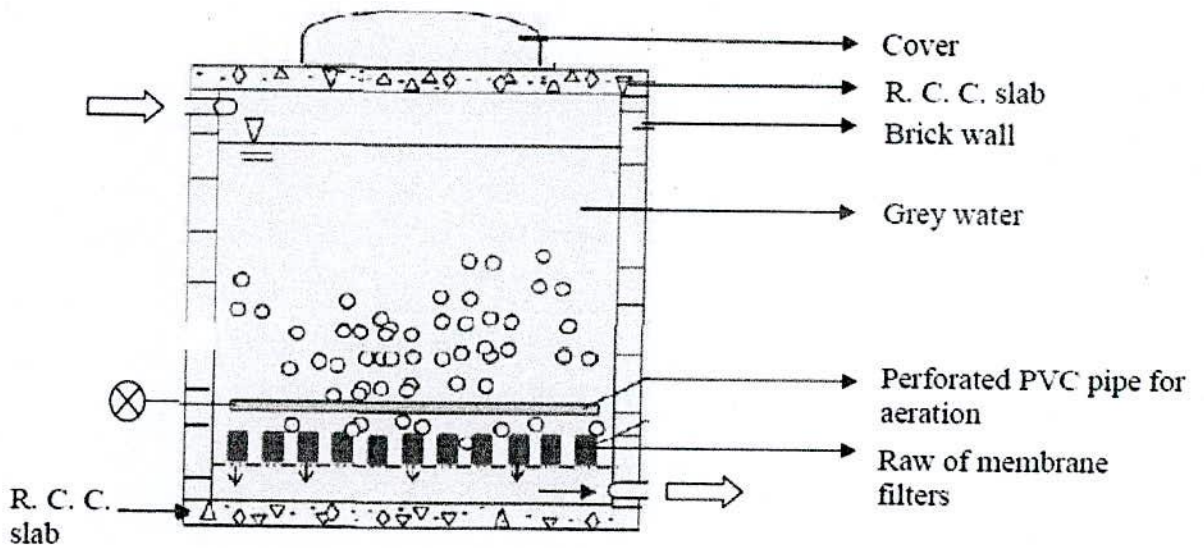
Details cross-section of side view of the tank (Hasan and Nakajima 2010).
